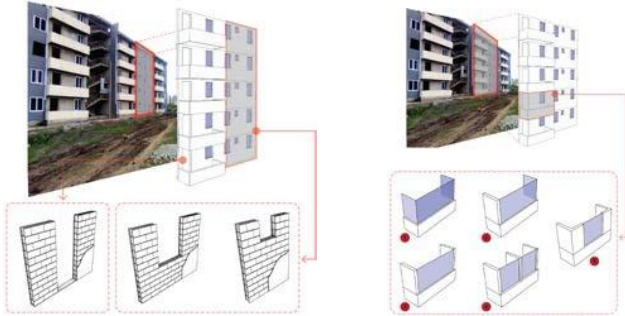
Openings in masonry header bond laying at door and windows and Fig 4.5 Balcony design modification patterns
